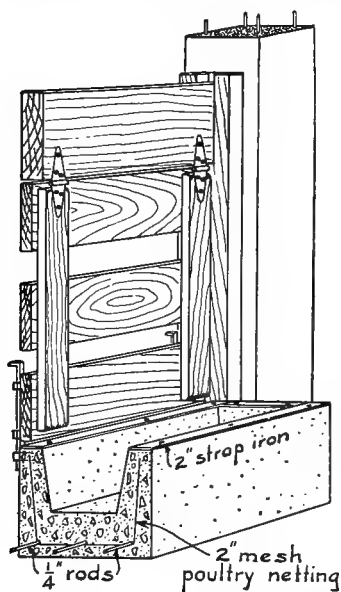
Concrete Trough and Trough Gate to prevent hogs from getting to trough while the slop is being put in. For the houses described in this booklet, troughs should be 12 inches wide, 10 inches high and 4 feet long, with a depth of 6 inches.
